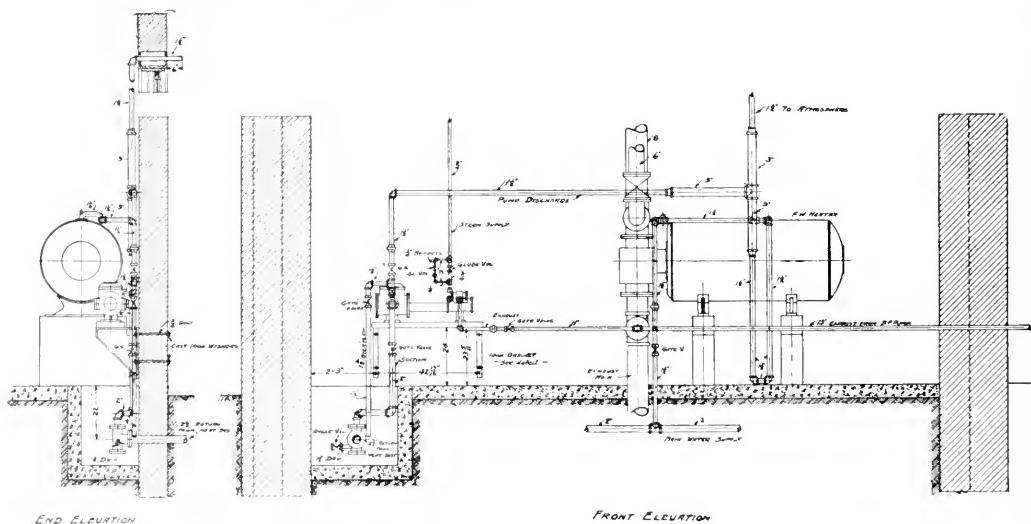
VACUUM PUMP CONNECTIONS AND DETAILS.
